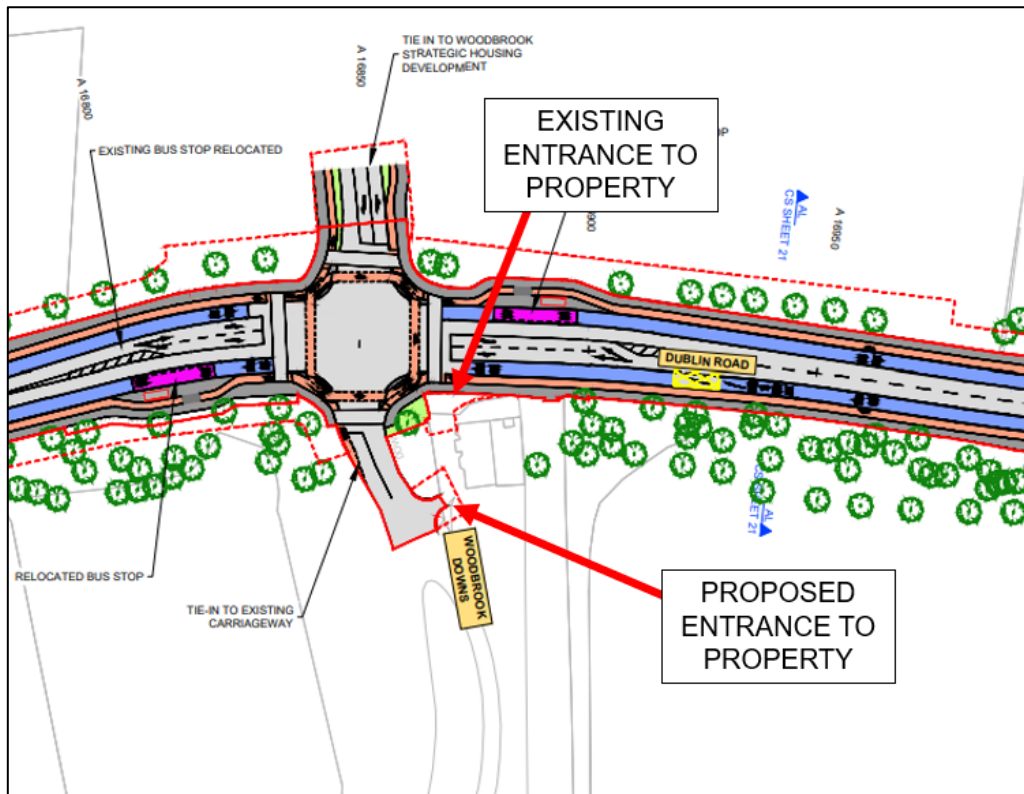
Extract from General Arrangement Drawings at Woodbrook Downs (Sheet 48)
